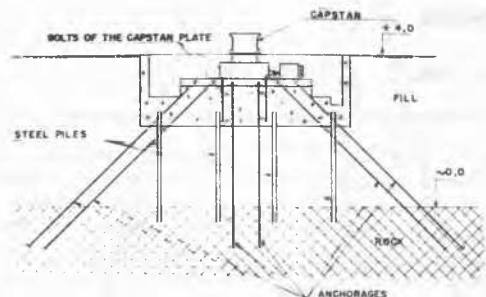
ARATU DRY DOCK - SALVADOR - BAHIA - CAPSTAN FOUNDATION ON PILES AND OUTSIDE ANCHORAGES
